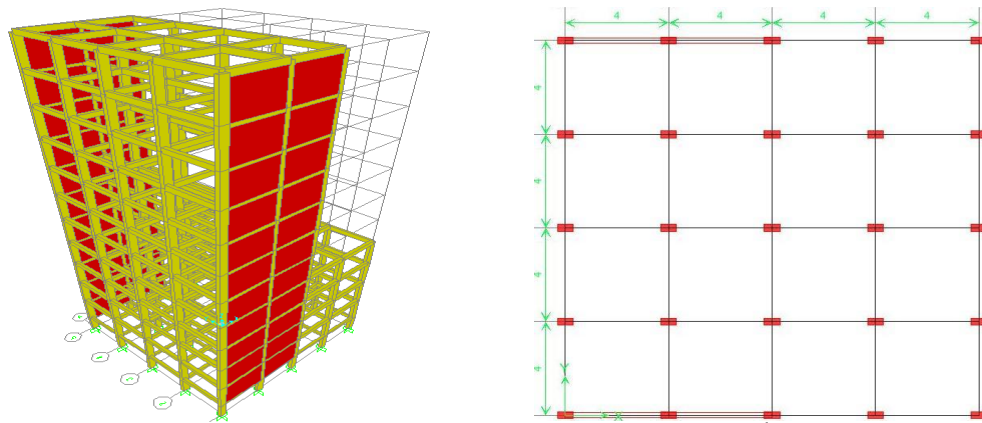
Elevation and Plan of building frame with setback in 2nd bay and shear wall
